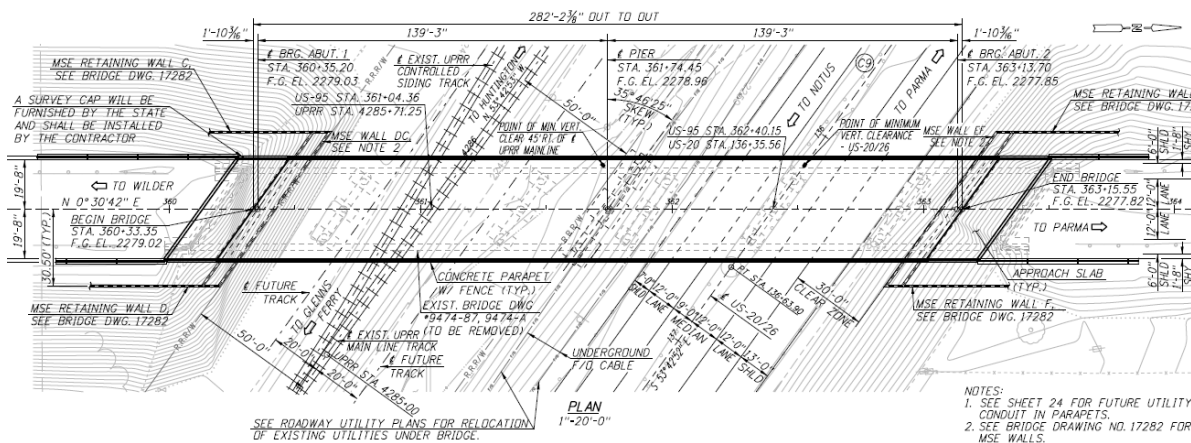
Plan View of US-95 over US-20/26 and UPRR at Parma, Not to Scale (NTS)
